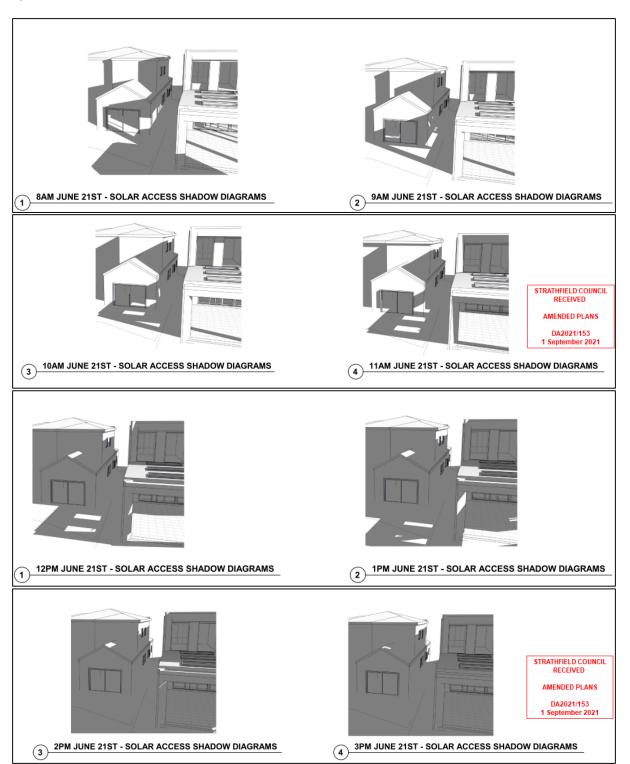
Shadow on elevation plans depicting extent of overshadowing to southern adjoining property.
